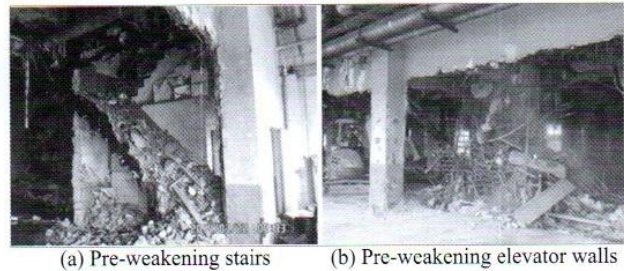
Photograph showing the Pre-weakening of stairs and elevator walls
